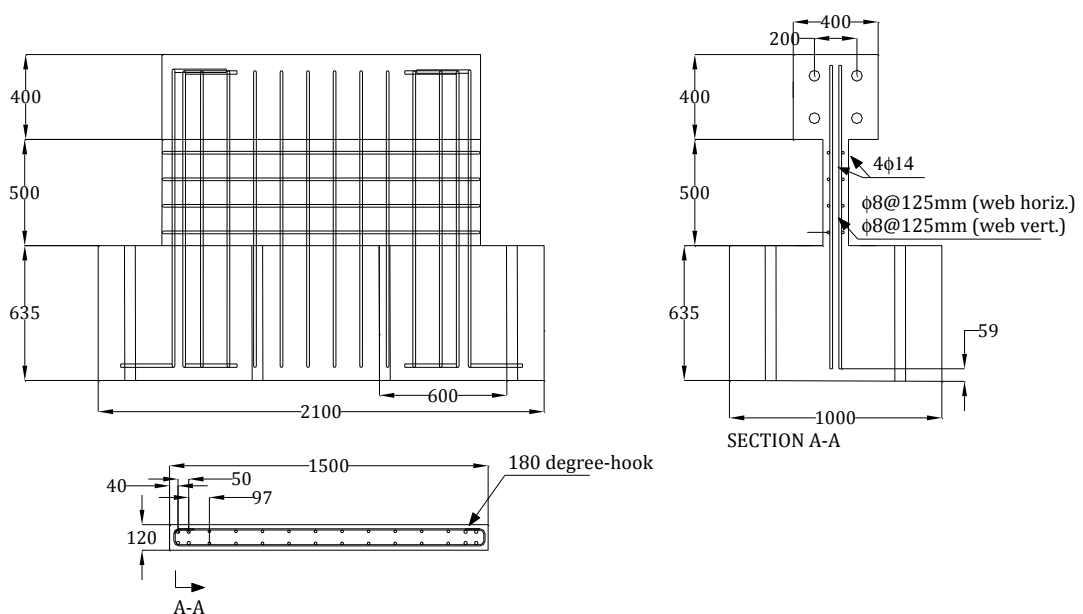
Geometry and wall reinforcement of specimen T4-S11.
